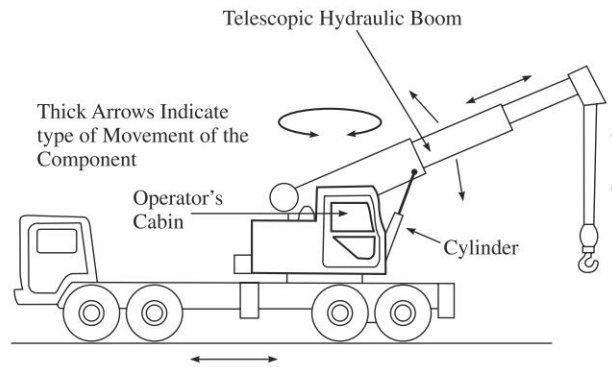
Schematic sketch of a modern wheel-mounted telescopic boom hydraulic crane
